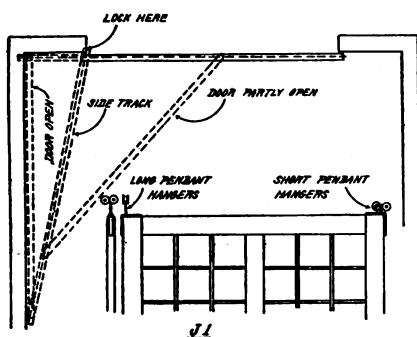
Plans and Partial Elevations of Doors Hung with Right Angle Garage Door Fixtures
